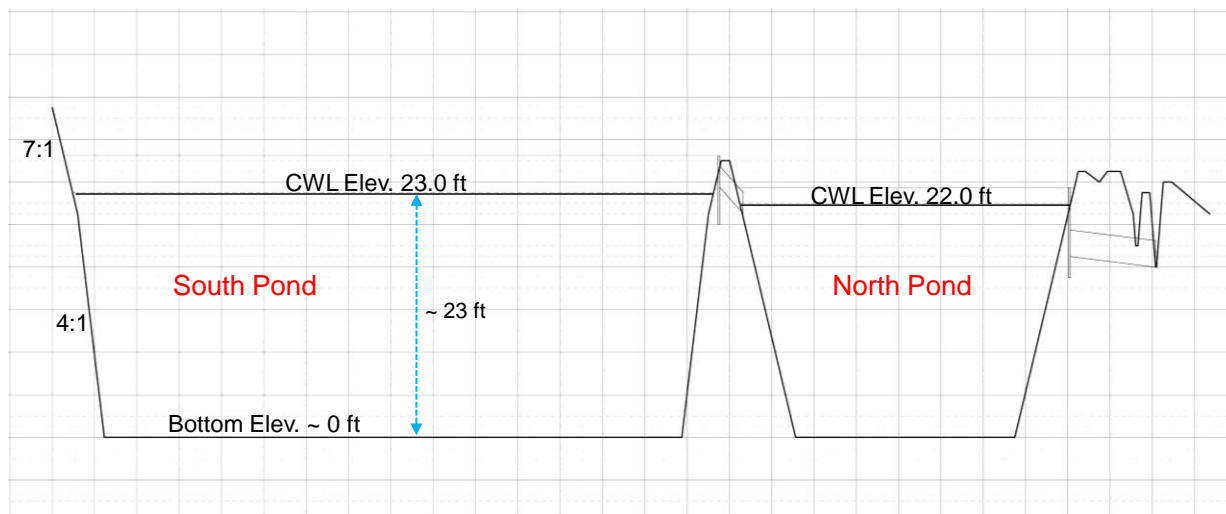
North-South Cross-Section to the South and North Ponds.
